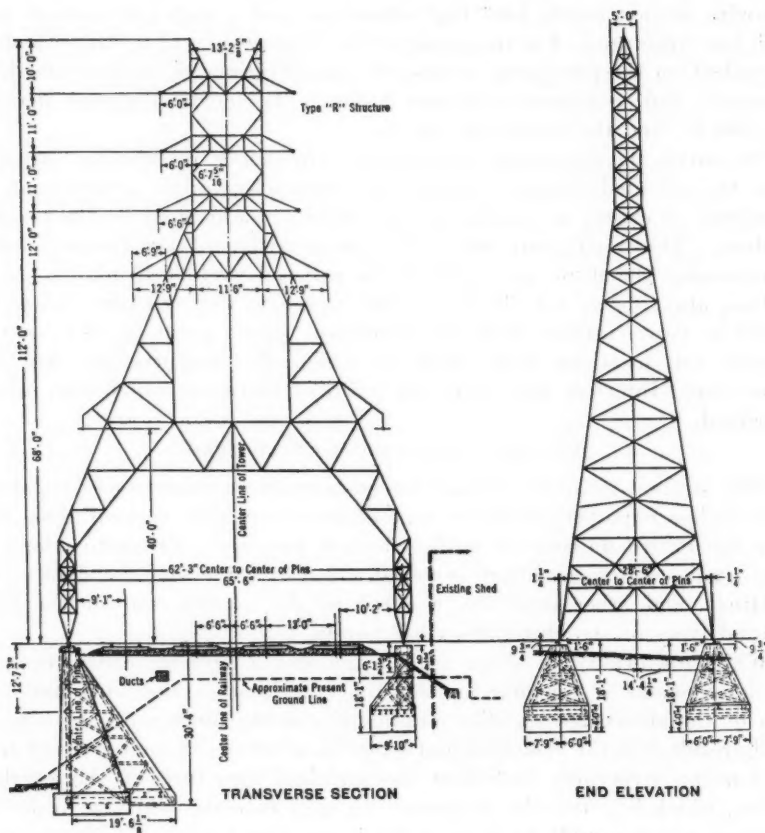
GENERAL DIMENSIONS OF A TYPE R BRIDGE STRUCTURE.
